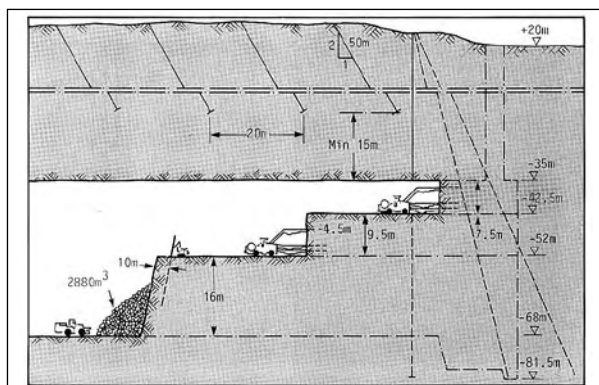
Typical excavation sequence; top heading and lower benches and with artificial groundwater infiltration from surface [Ref. 5]
